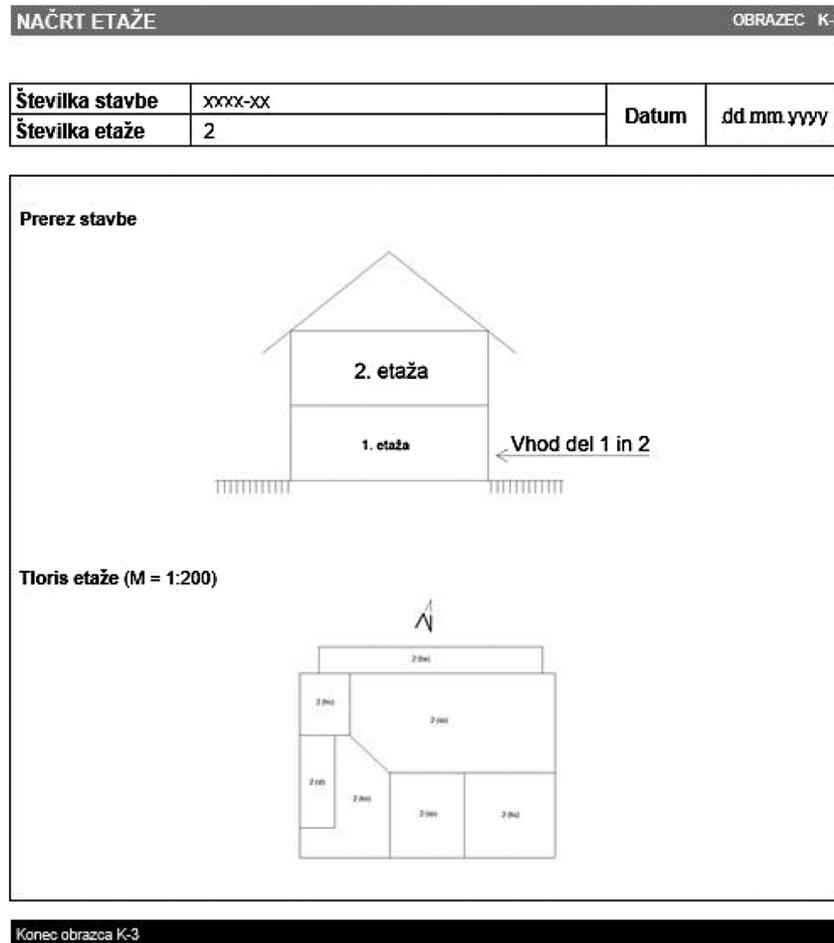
Sample document of Slovenian Building Cadastre containing the building floor plan.
